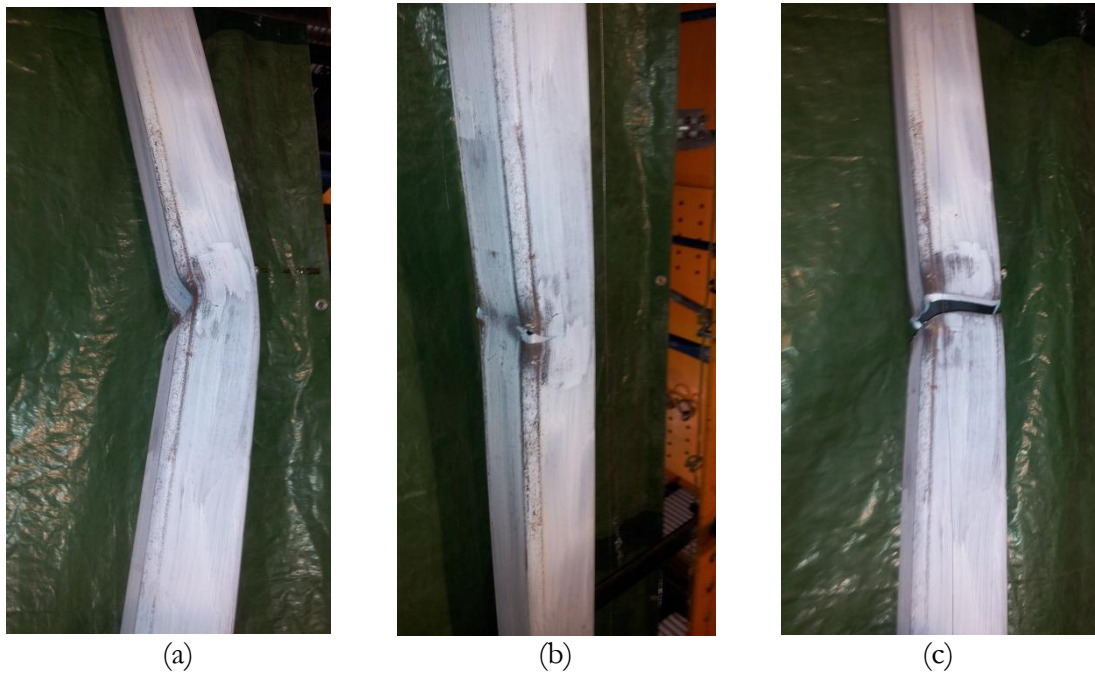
Specimen E-1: (a) Local buckling; (b) Tearing; (c) Fracture
